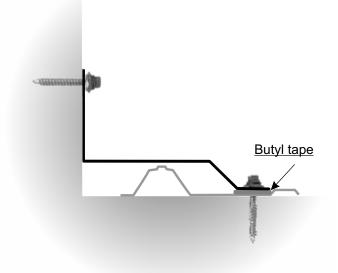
Sidewall flashing is applied when the side of the roof butts up against an adjacent wall. The wall-side of the flashing can either be covered over with siding or sealed with caulk. Butyl tape should be applied where the "foot" of the flashing attaches to the roof.
